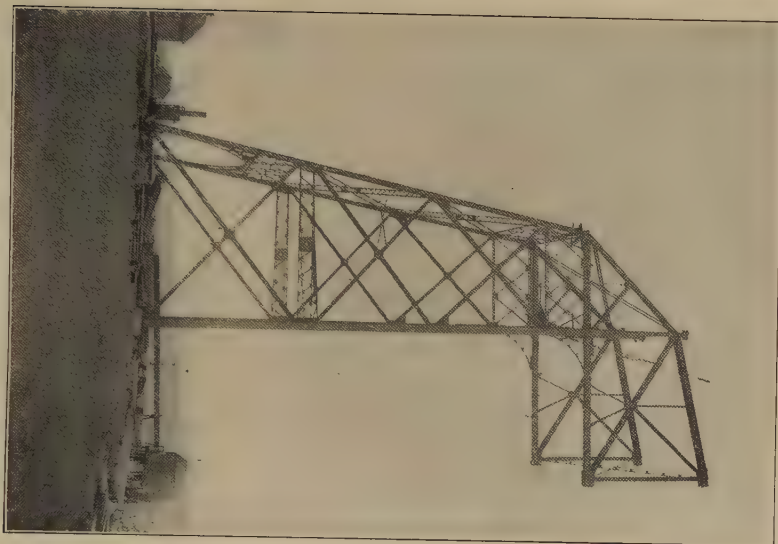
DULUTH FERRY BRIDGE, SOUTH TOWER.
